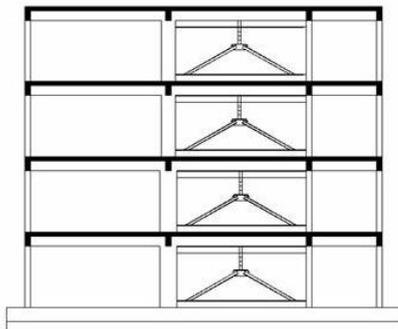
Elevation view of the R/C frame retrofitted with eccentric steel bracing
